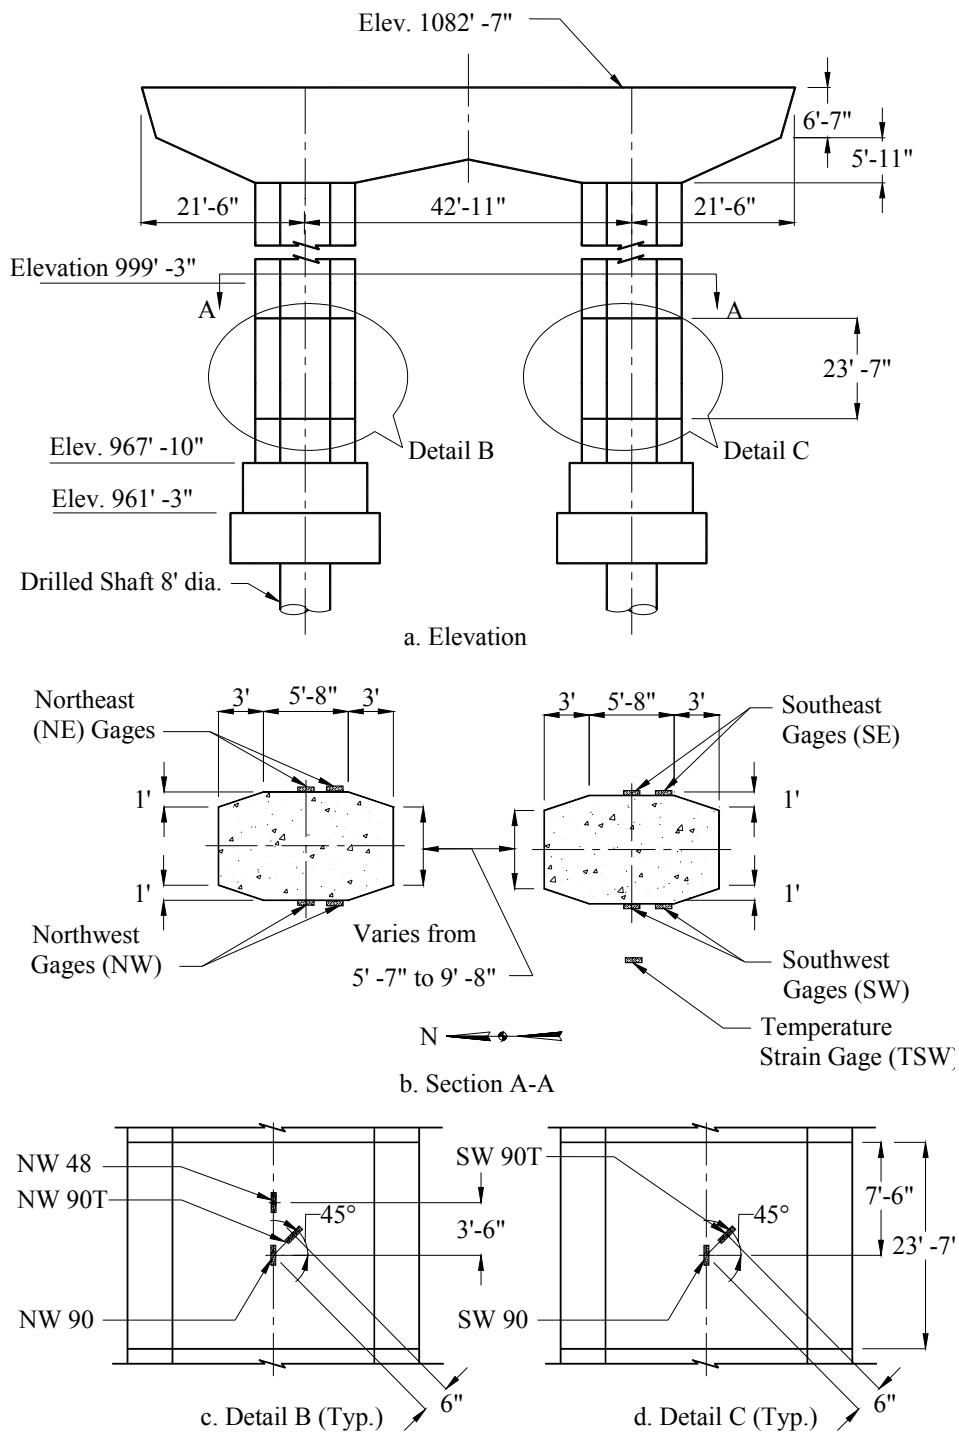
Instrumentation of Pier 3 – Launch EB3.
